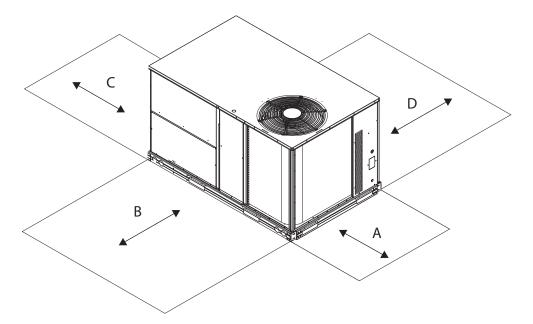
Unit Dimensional Drawing — Size 16 Unit (cont)
